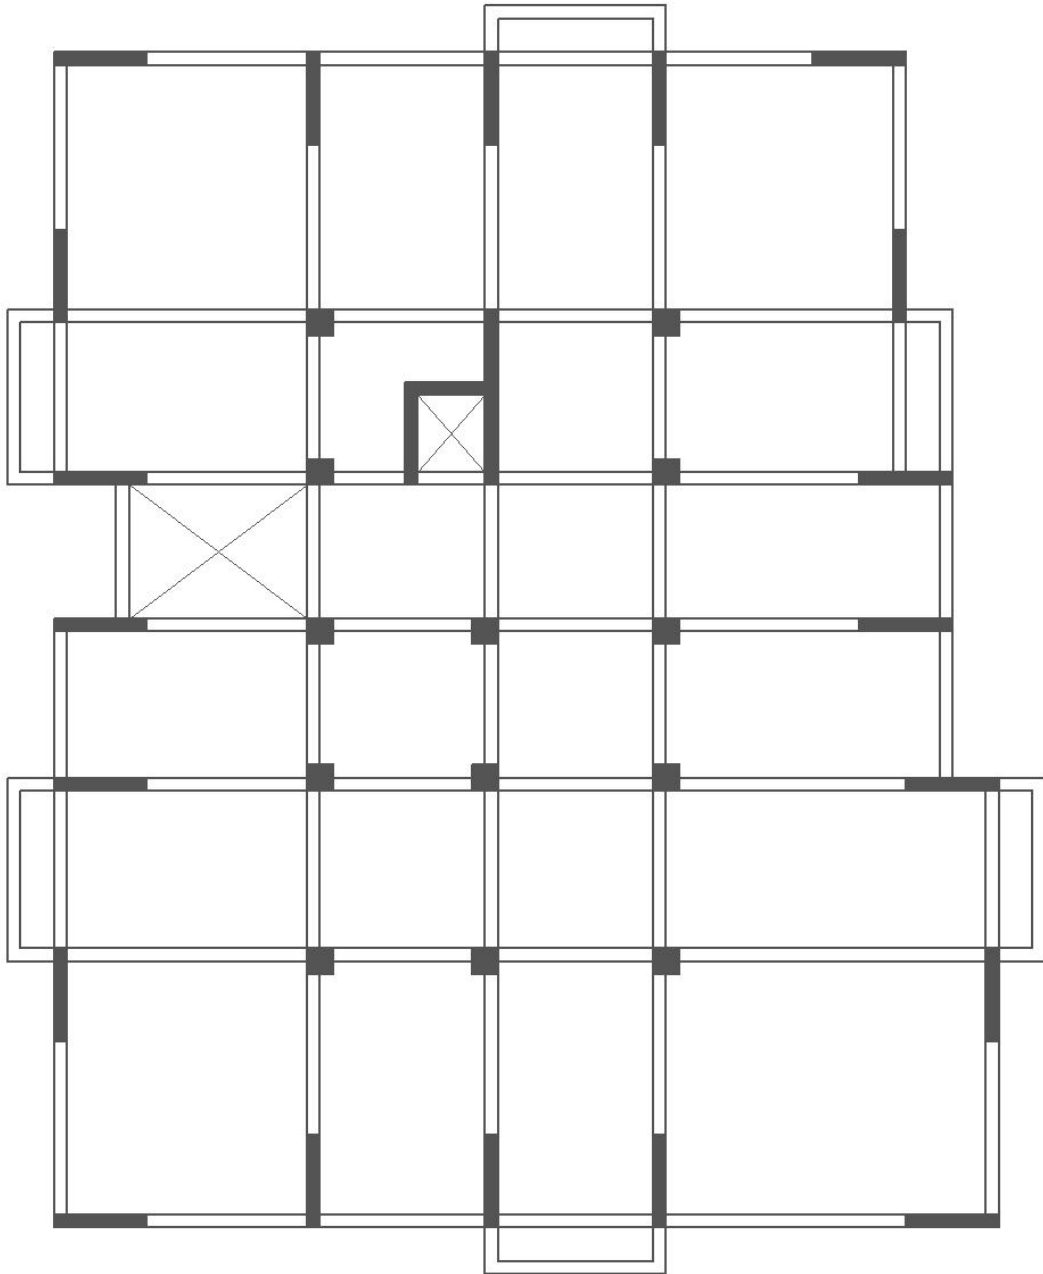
Structural Plan of Model-2 with Regular Structural System
